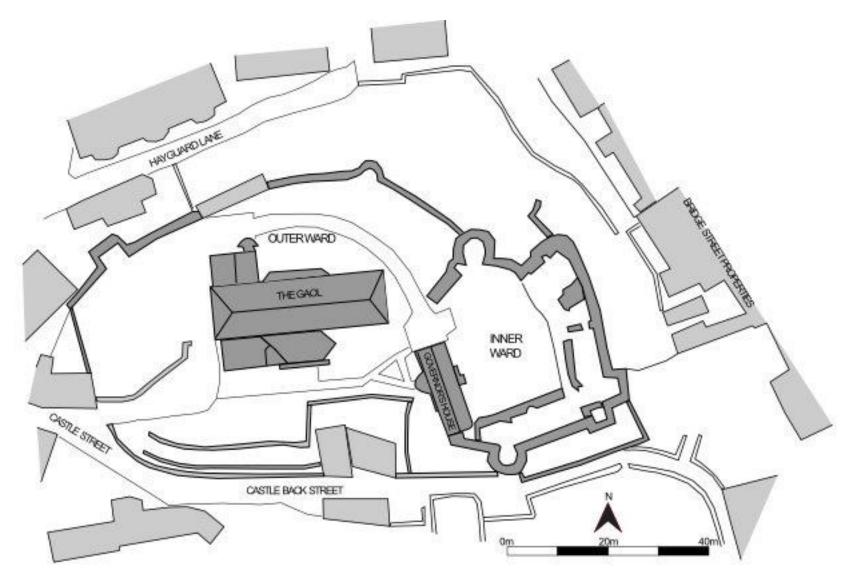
Detail location plan showing the former gaol building within the Haverfordwest Castle site.
